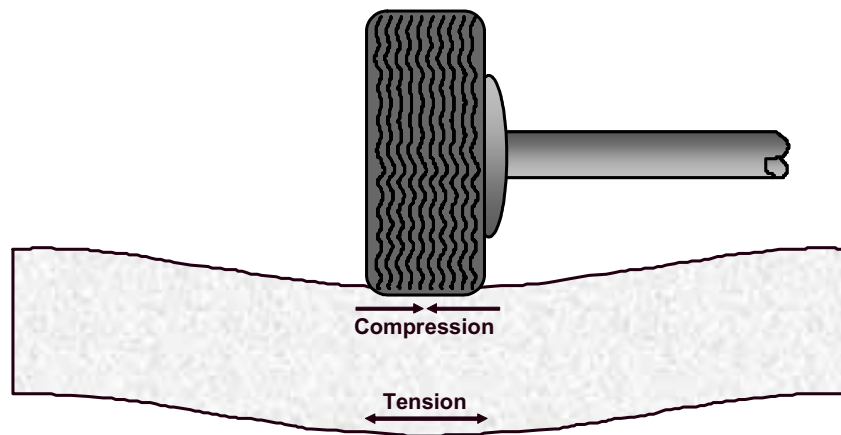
Slab stresses at top and bottom of slabs due to wheel loads
